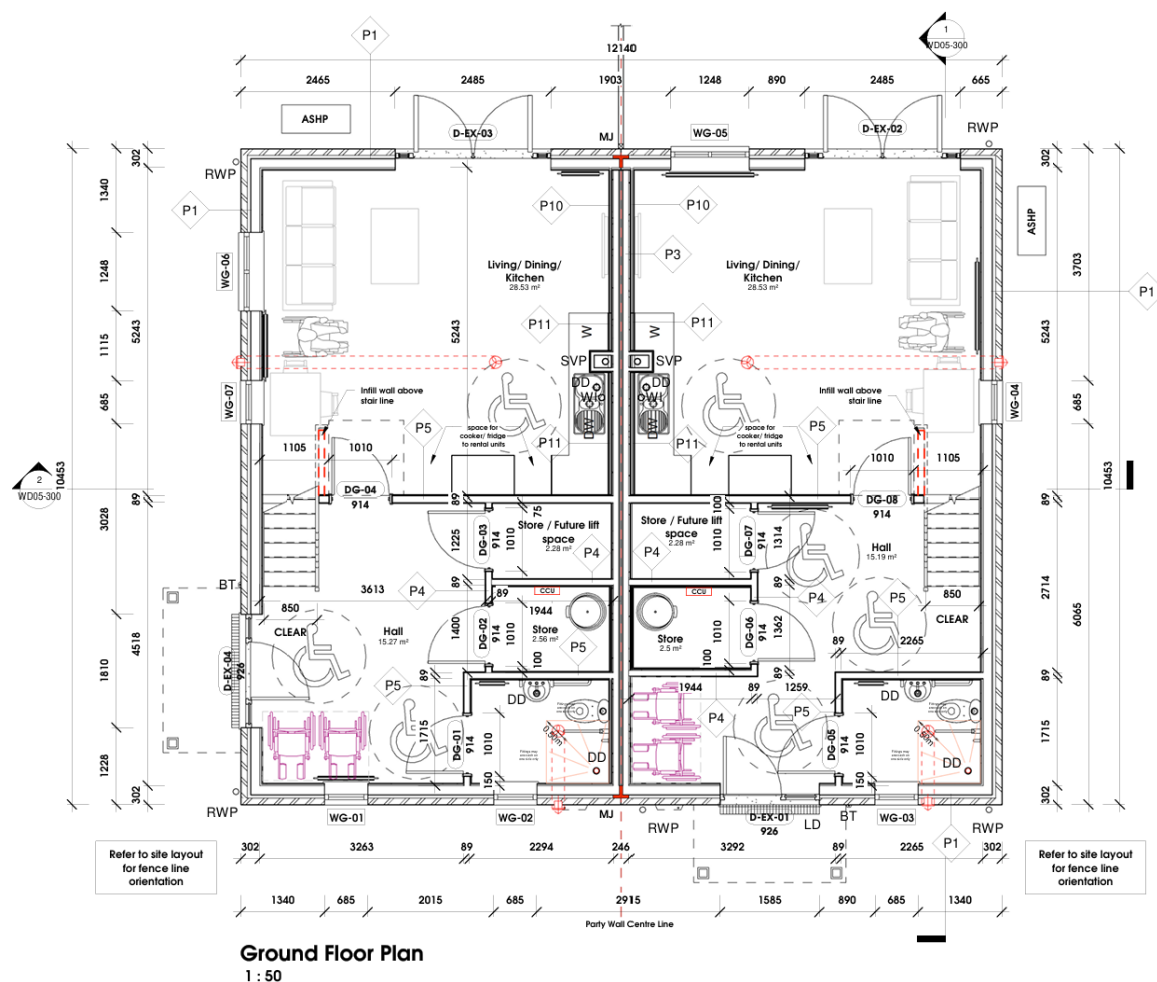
This ground floor plan is an example of a property that has been designed to provide an accessible living space. The downstairs bathroom has been enlarged to accommodate a shower stretcher, while the upstairs bathroom has been made slightly larger to allow for the potential installation of a specialist bath in the future. The ground floor plan also includes a designated store/future lift space, providing flexibility for additional accessibility adaptations if required.
